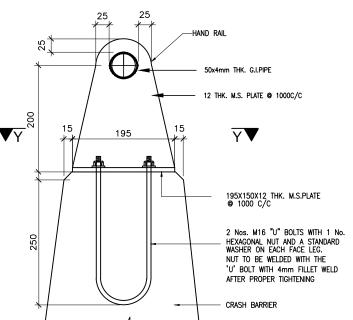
DETAILS OF CRASH BARRIER, 1:10 (FOR DIMENSION ONLY)
